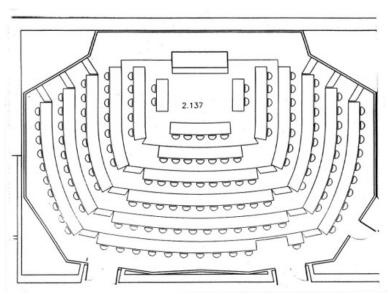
The Floor Plan of the Un-Renovated Space Showing the Furniture Plan
